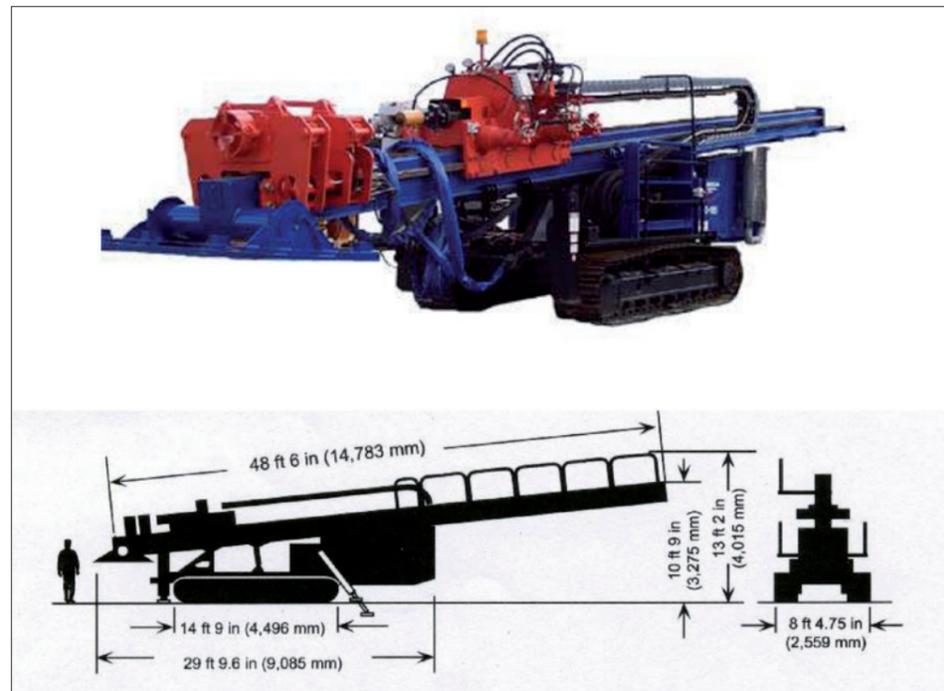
| The dimensions and appearance of a horizontal directional drilling (HDD) rig similar to that which would be used to drill under the coastal defences (photograph copyright © LongboreTT Ltd)
